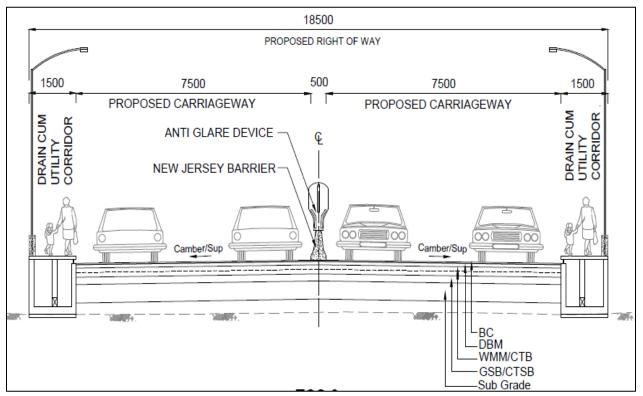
TCS-6: Typical Cross Section for 4 Lane Divided Carriageway without Service Road
